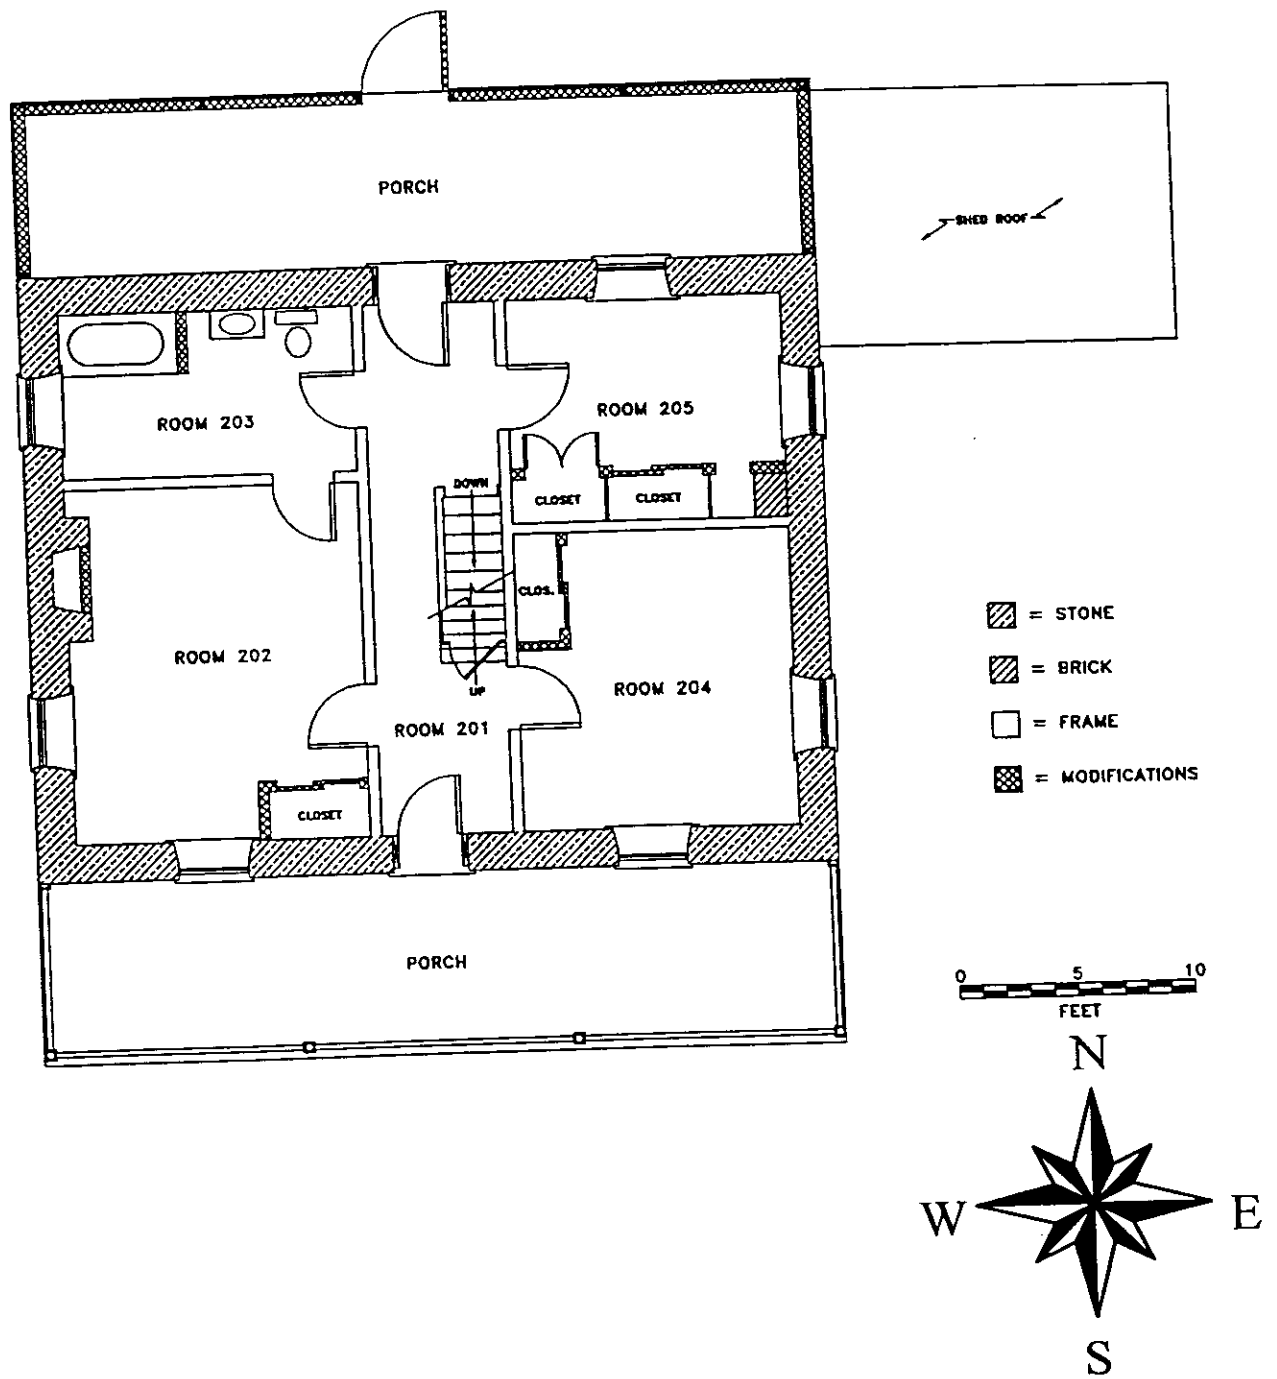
Second story floor plan of the Smith/Duncan House, existing conditions.
